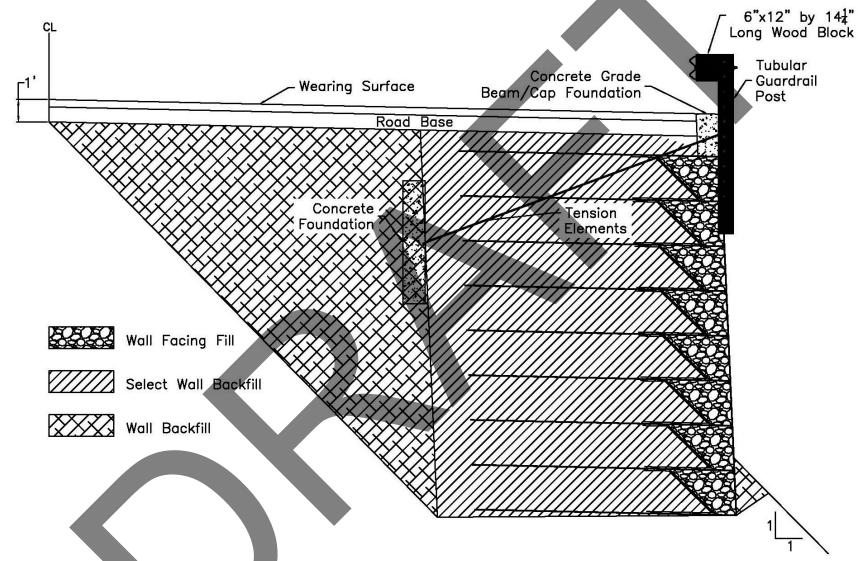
Schematic. MGS System with Tubular Post, Concrete Foundations, and Tension Elements.
